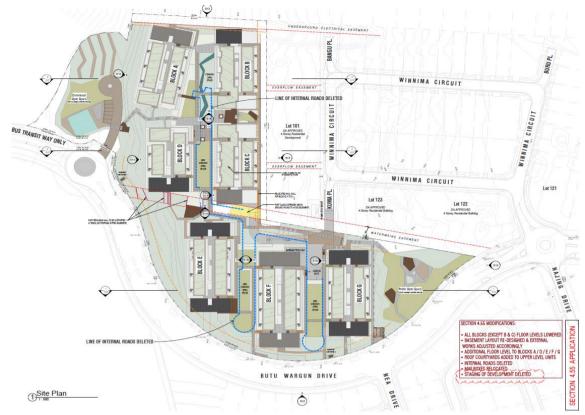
Site Plan showing proposed deletion of internal roads dashed in blue (Drawing No. S01, Issue I, prepared by Architex, dated 14/05/2021)
